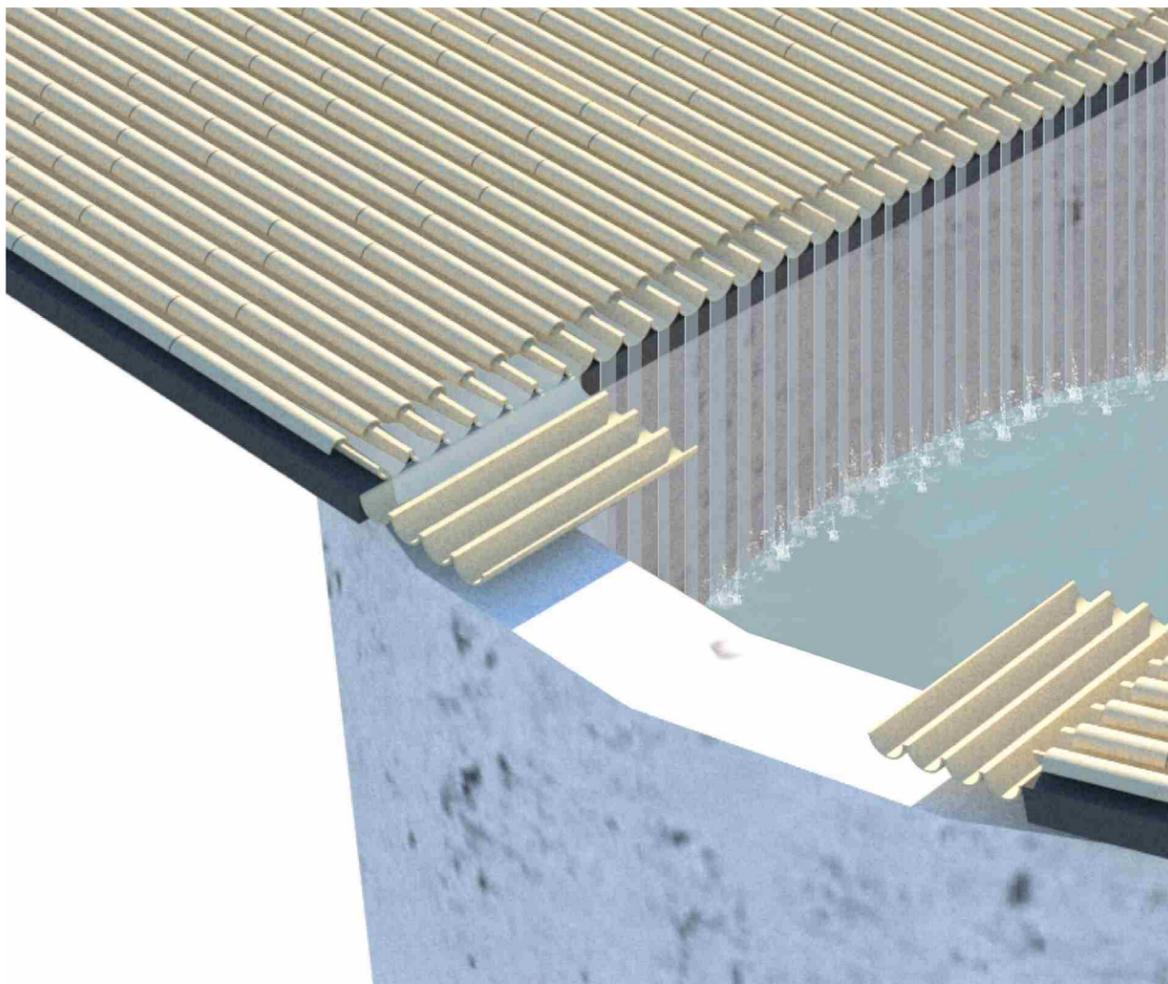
How Bamboo Bring Water into Cylinders, photo by author
